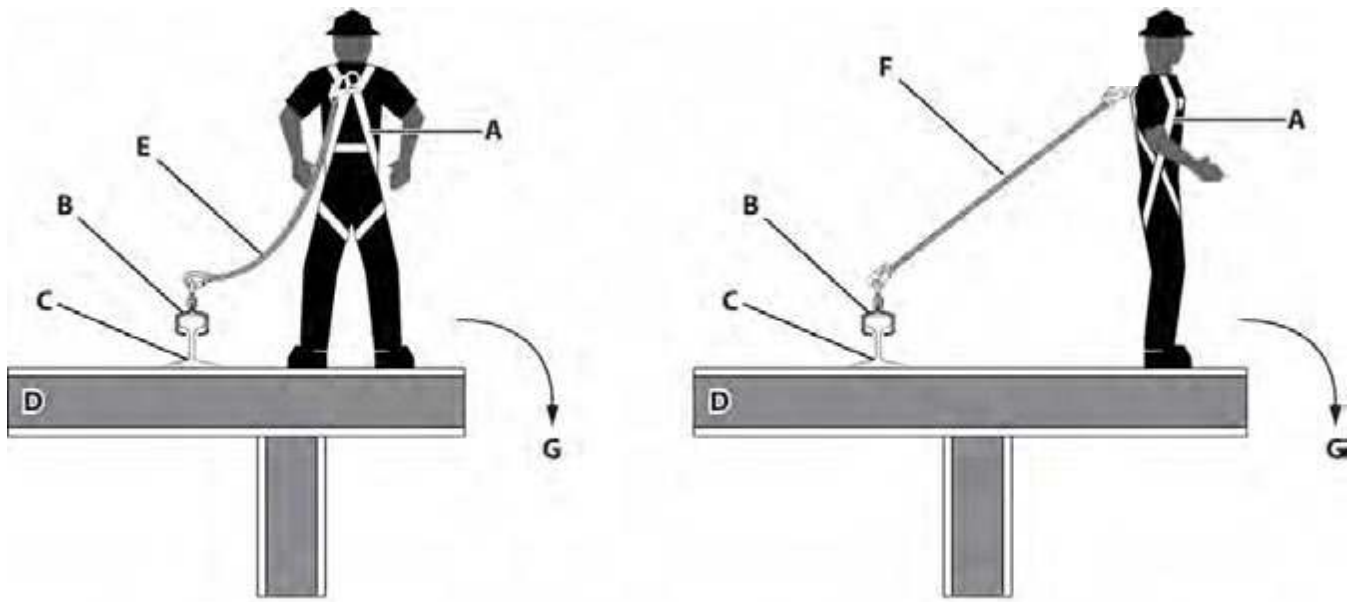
Rail Anchor Used for Fall Arrest and Restraint
